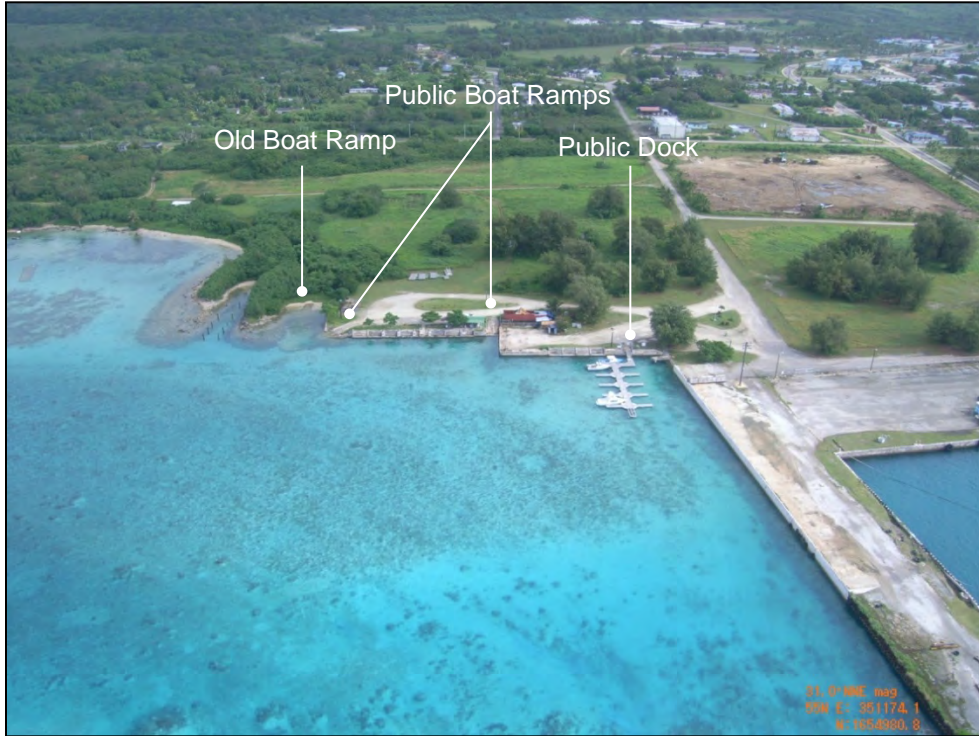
Port of Tinian Boat Dock and Ramps
